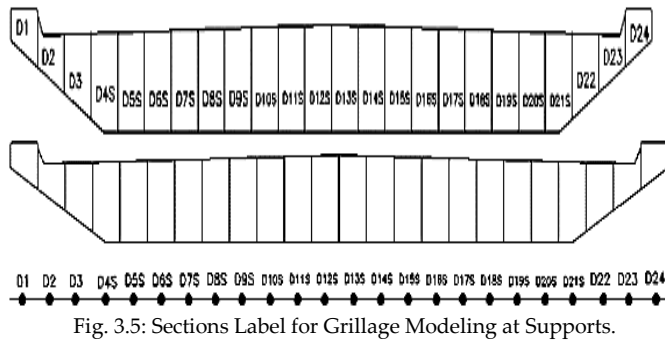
Sections Label for Grillage Modeling at Supports.
